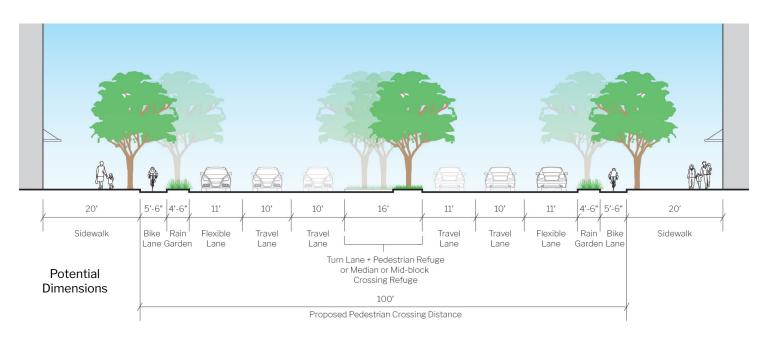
FOREST AVENUE CONCEPT - PROPOSED STREET SECTION
